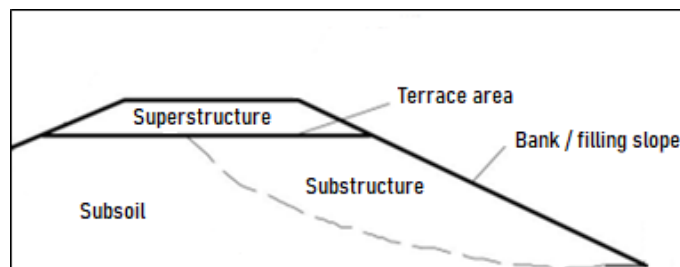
Typical structure of road construction (Modified after Trafikverket, 2005a)
